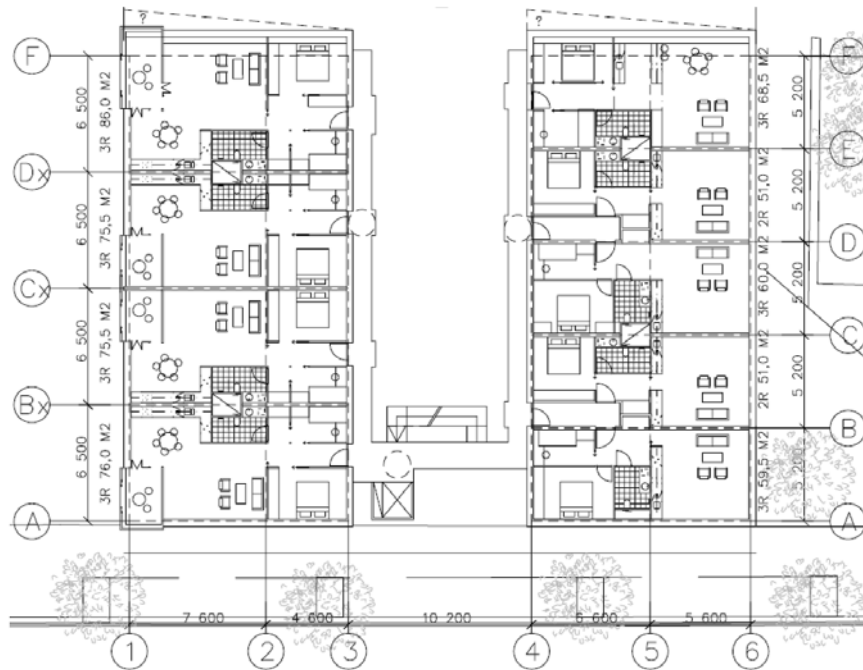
Sketch of the 2<sup>nd</sup> floor of the apartment building [Hjerkin, 2007].
